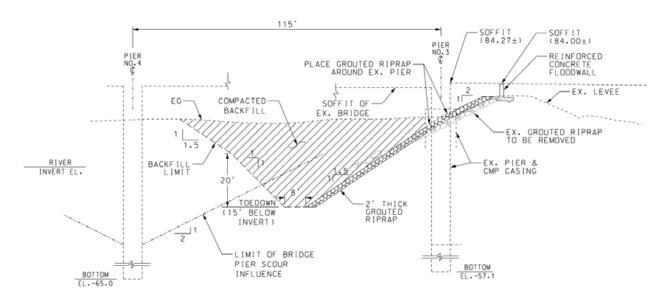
Typical Levee Protection underneath Hwy 101 Bridge
